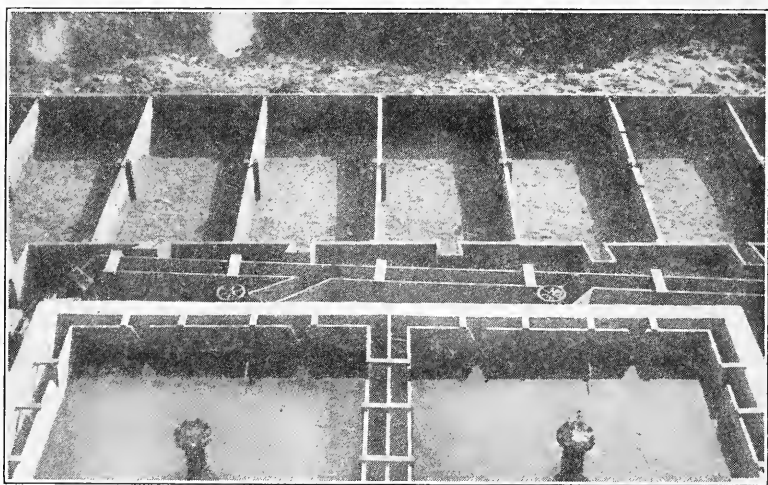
Sludge Drying Beds, from top of Settling Tanks.
